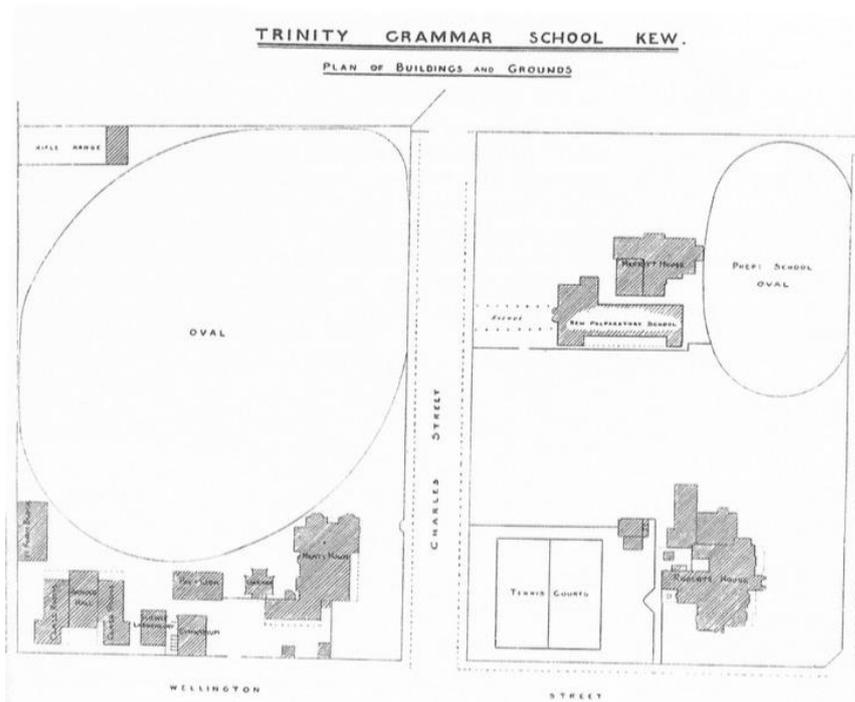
Plan of extended school with houses renamed, 1925. Note that North is down. (Source: Carolan 2003b:261)
